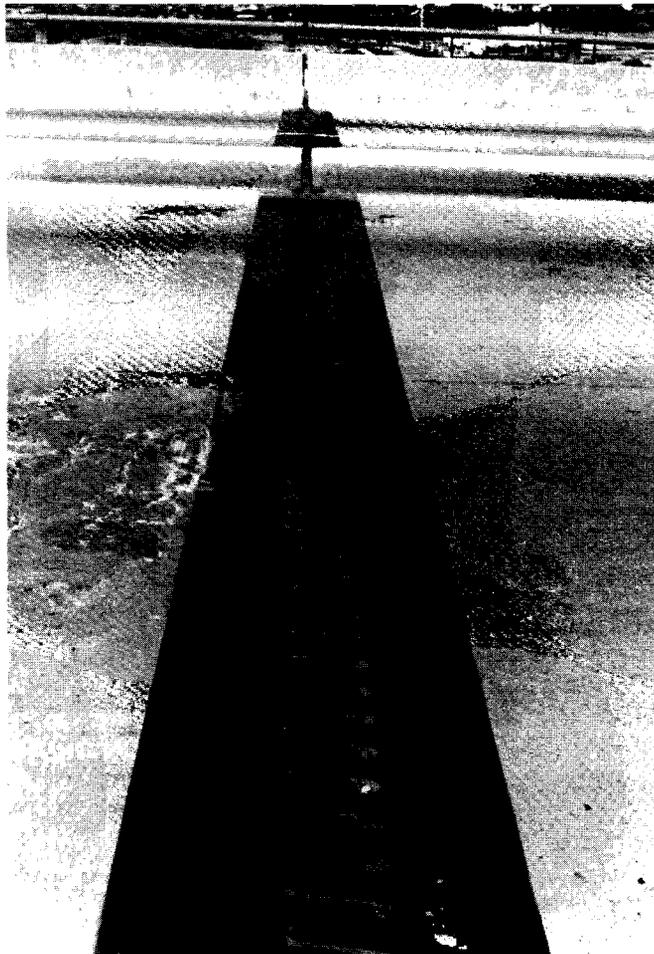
U.S. 87 Overpass, Bent 4 armor joint
